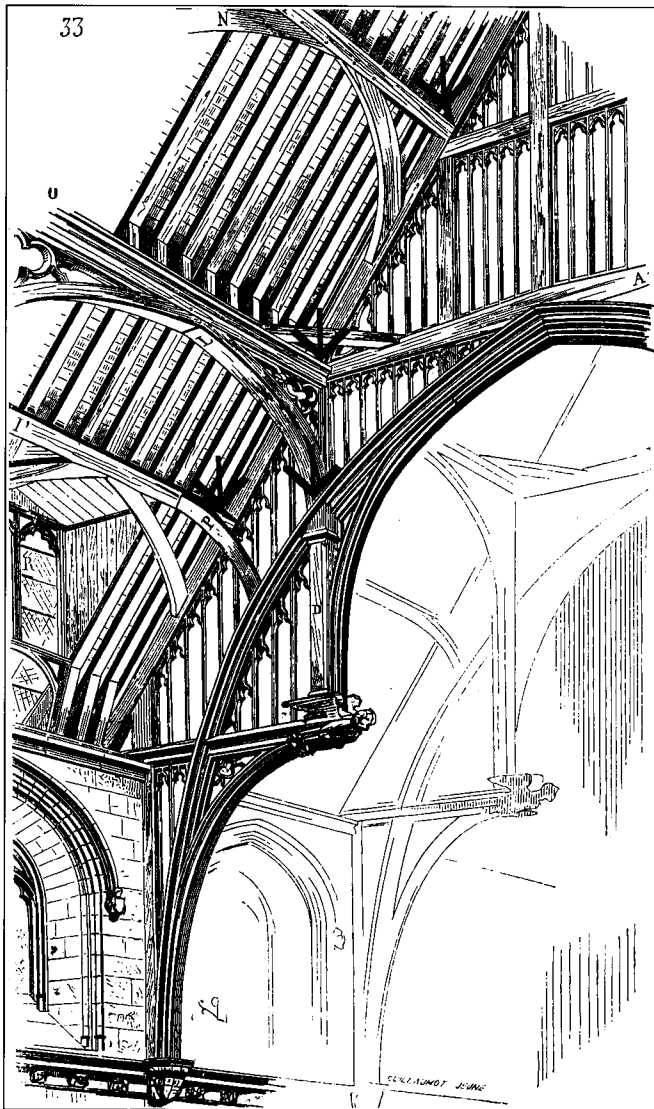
E. E. Viollet-le-Duc, detail of framing, Westminster Hall roof, *Dictionnaire raisonné* (1854-1868). Arrows, added by the authors, indicate points of loading from the roof.
